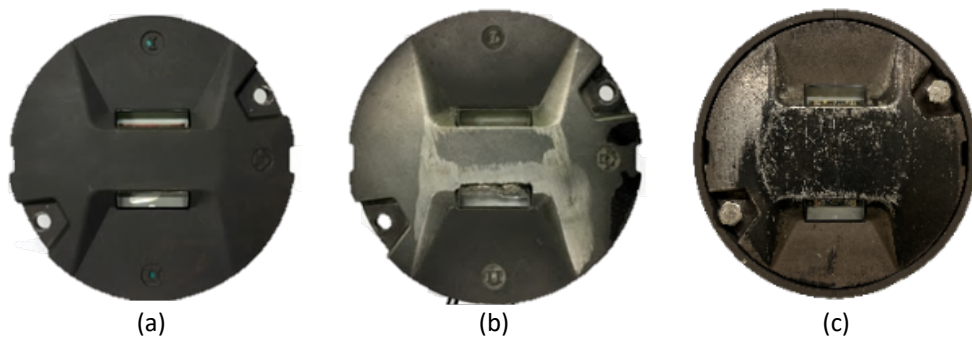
Runway centerline lamp (IDM5582): (a) new, (b) damaged, (c) covered with rubber from plane's tires
